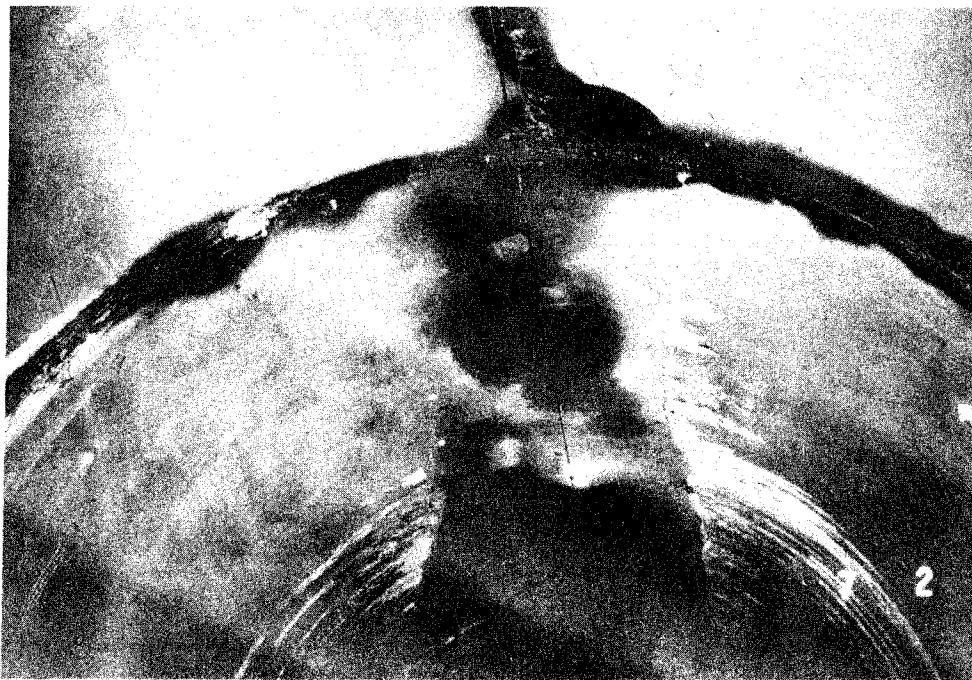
Monolith joint 4/5 after grouting, Blakely Mountain Dam, 1986
